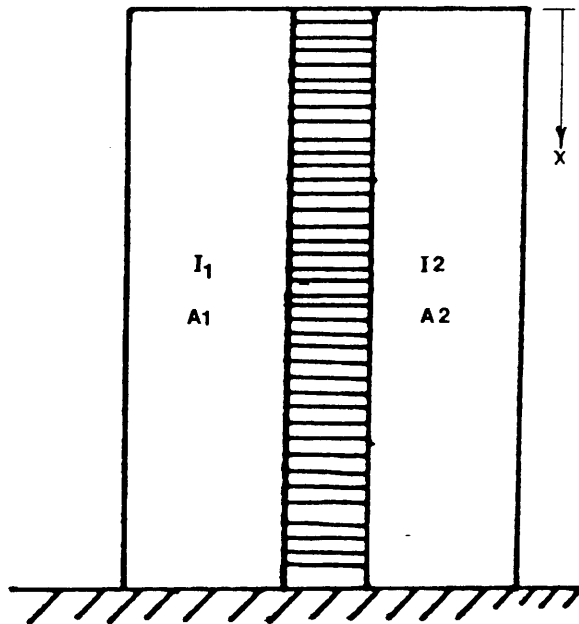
Shear wall with idealized continuous connection of laminae.
